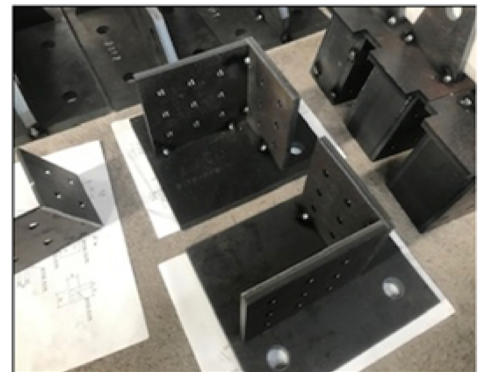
The project structure and specific construction components. Source: Education above all foundation.
